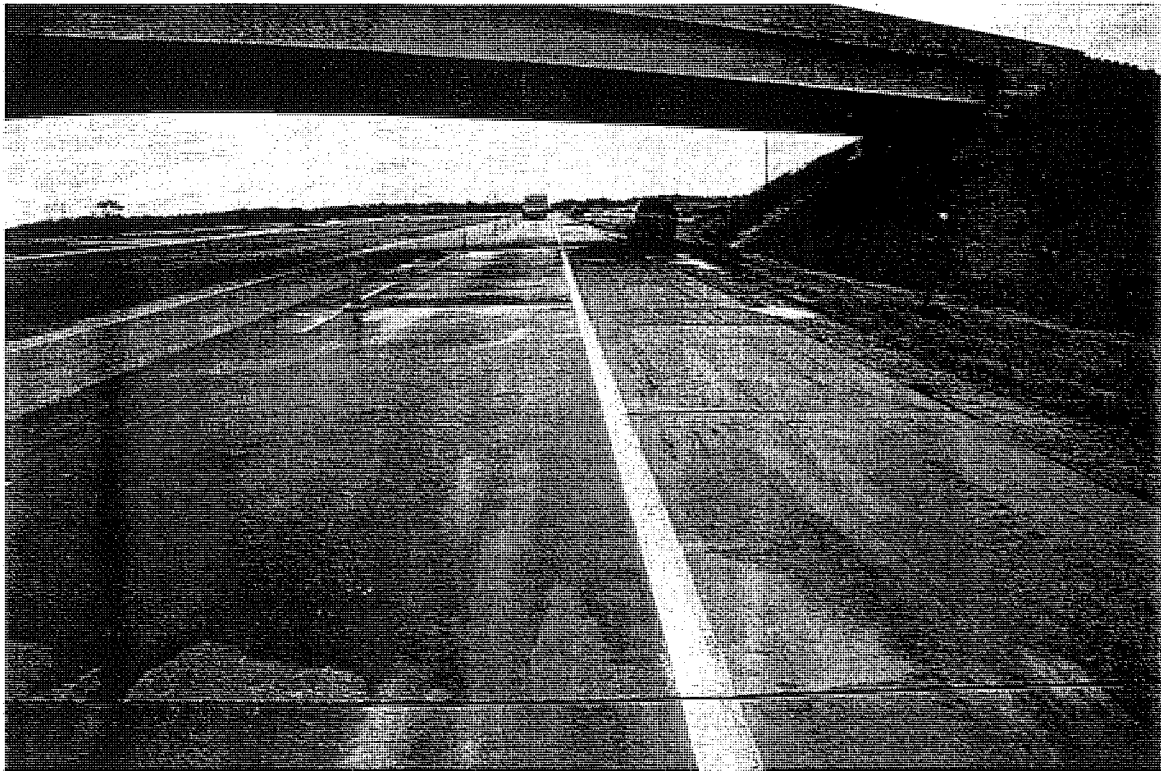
An overview looking east on CSN# 77024-17988A (Section B), EB. The third point intermediate shoulder joints can be seen. Slabs are 41 ft long in the driving lanes.
